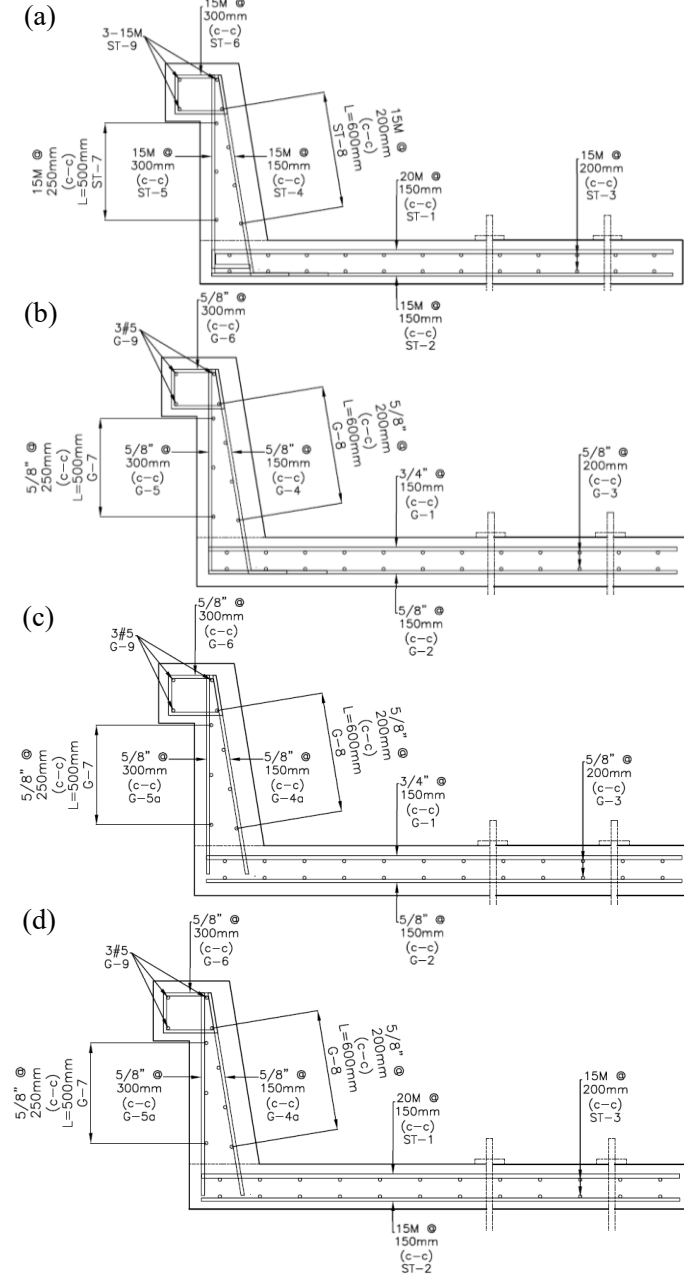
reinforcement layout for (a) SP-01, (b) SP-02, (c) SP-03, and (d) SP-04. Bar covers given in Tables 4.1 and 4.2. Reinforcement details given in Fig. 4.3
